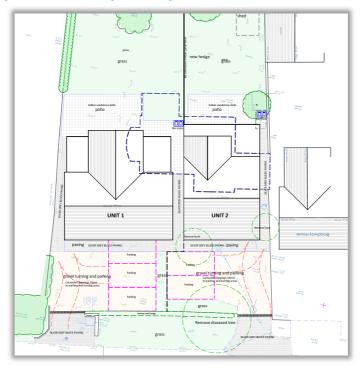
Proposed dwellings brought forward within the site (existing footprint shown with dotted line). Not to scale extract from Sam Russell Architectural Design & Planning submitted drawings
